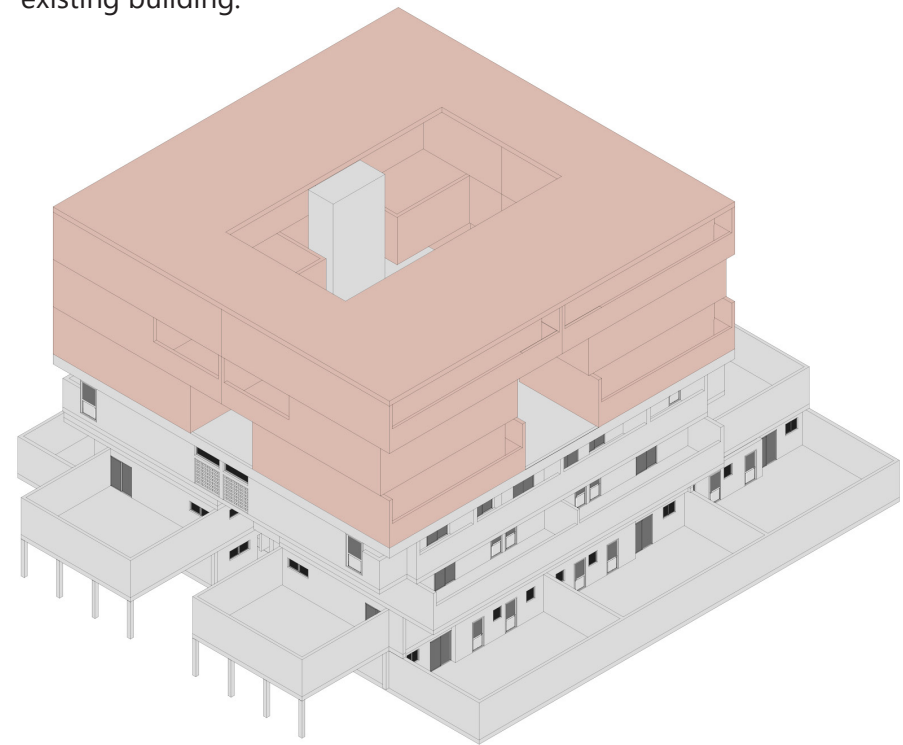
3D view of the Patio building with the new construction addition placed on top of it.
